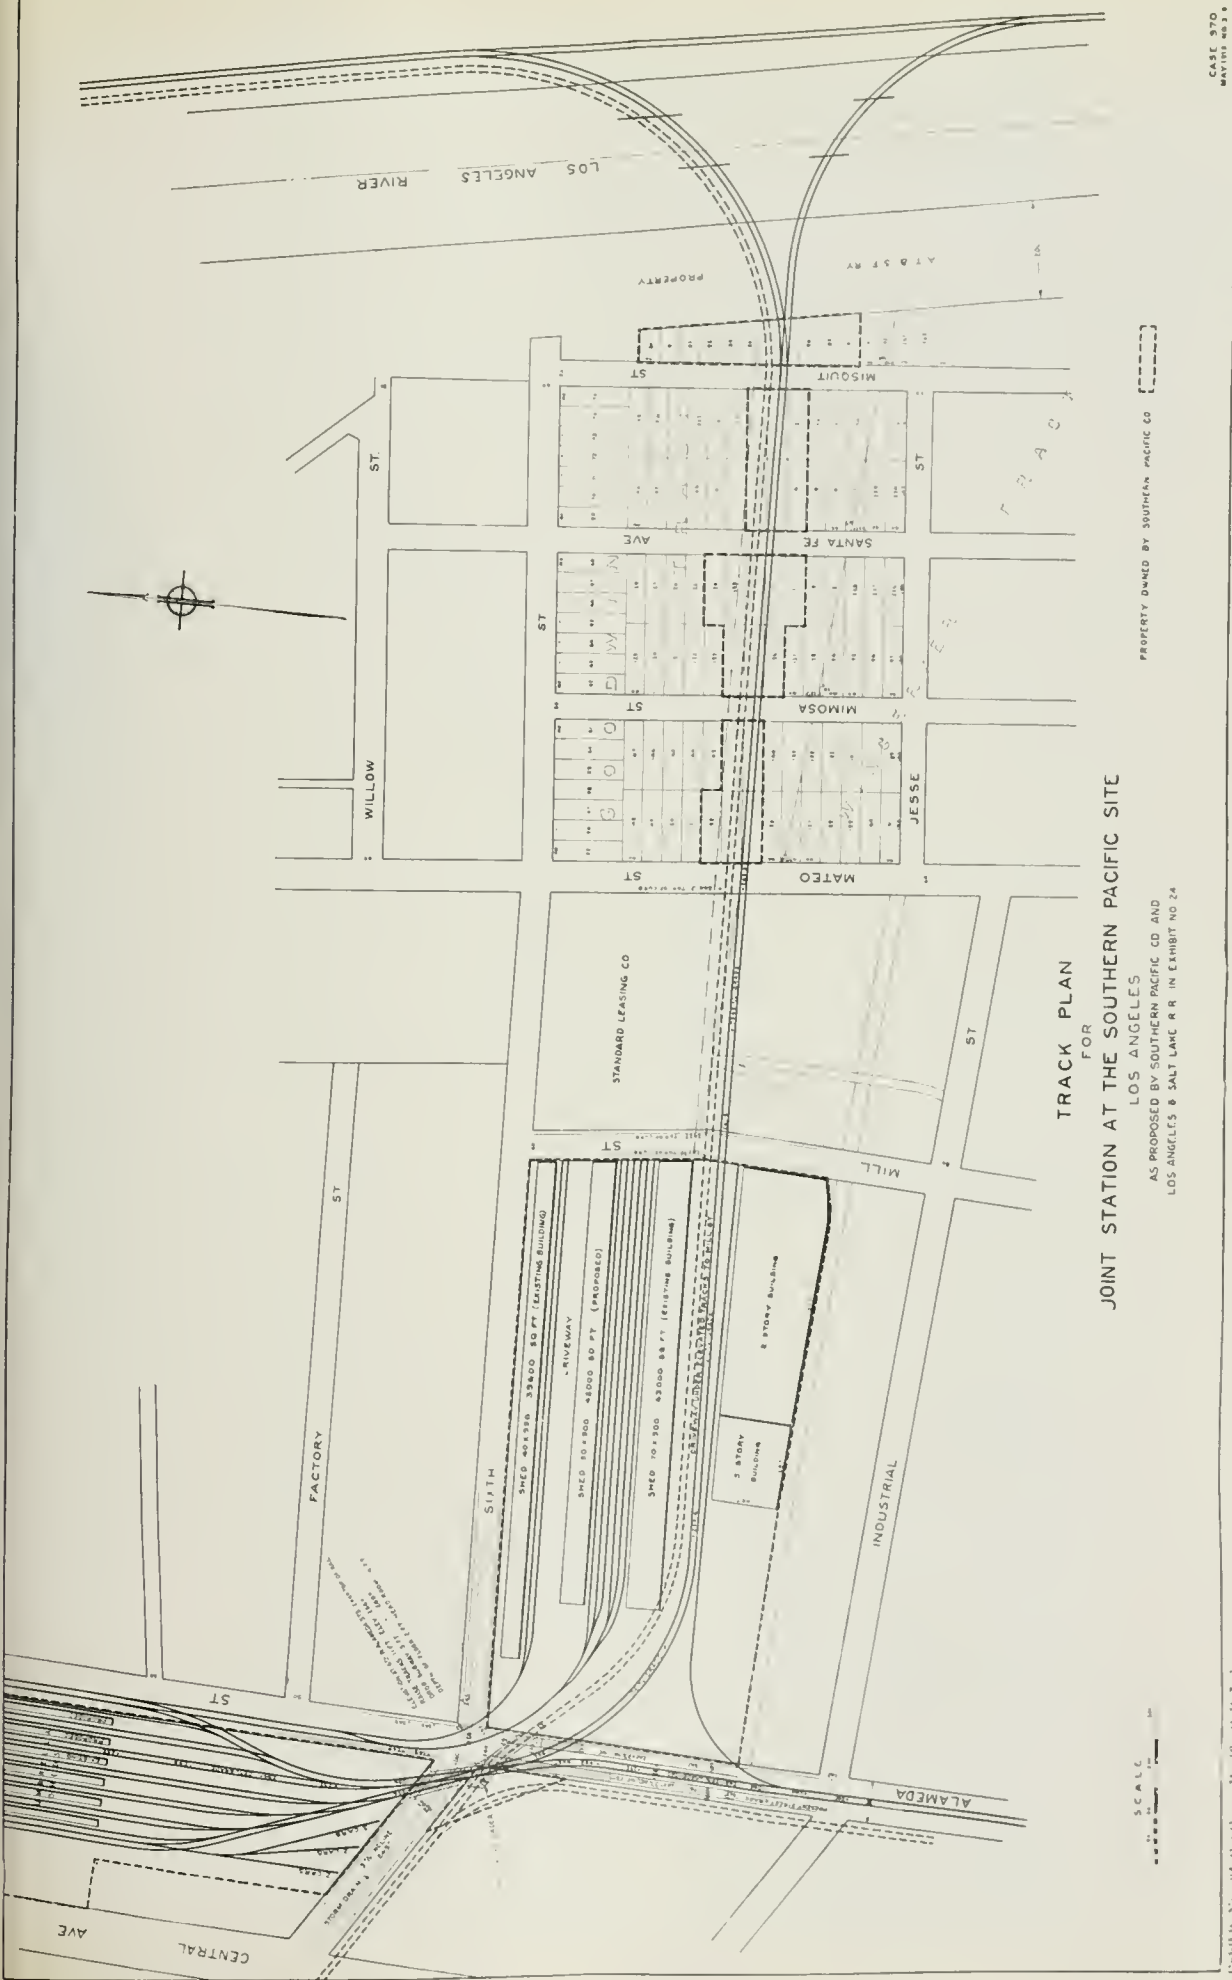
TRACK PLAN FOR UNION STATION AT THE SOUTHERN PACIFIC SITE
